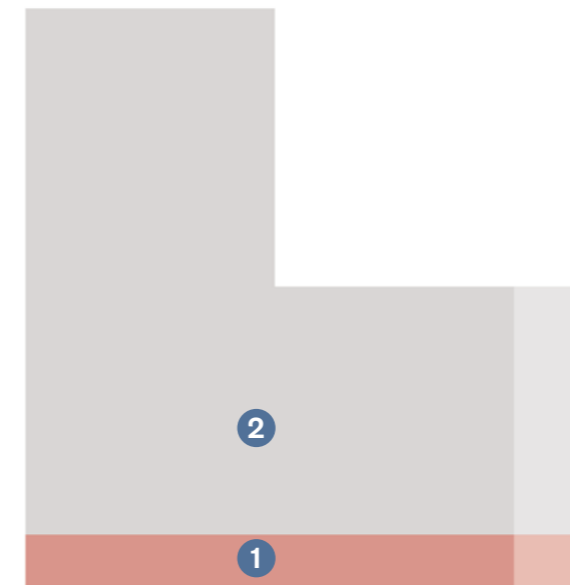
Building C (Enterprise Yard) Facade Principles - 01
